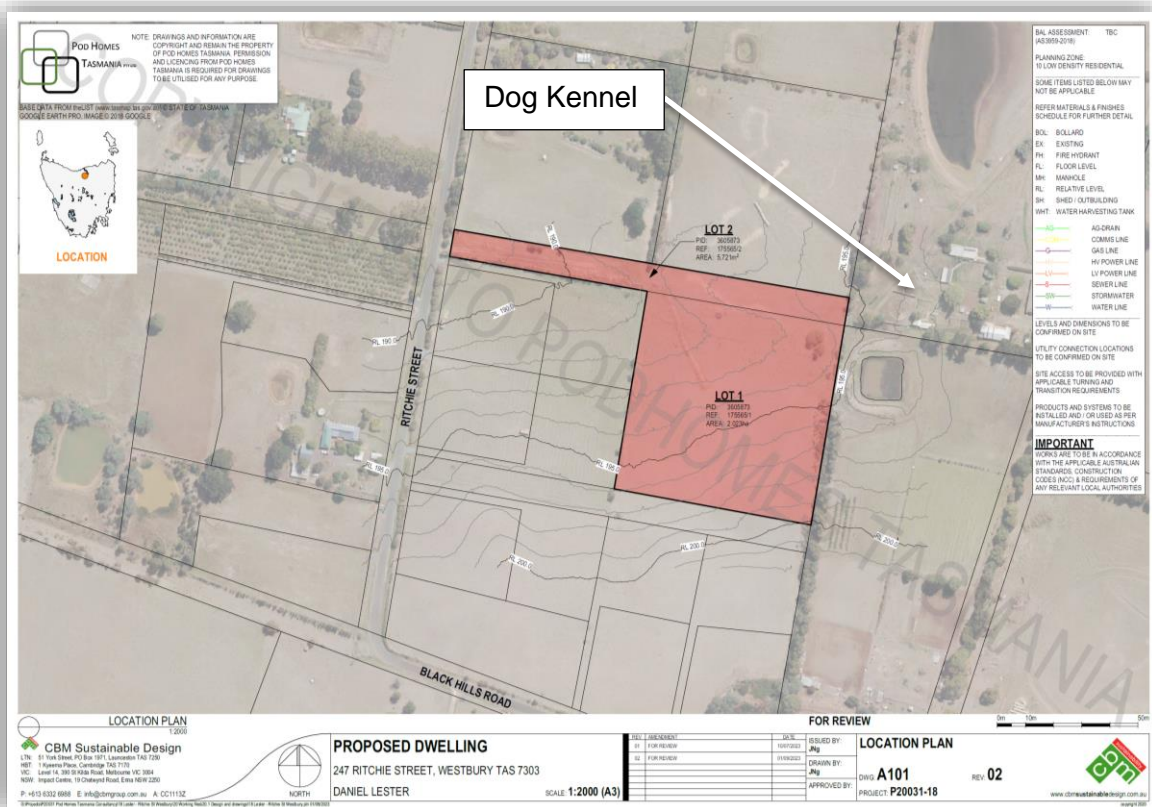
Location and site plans for the proposed dwelling (provided by PHT).
